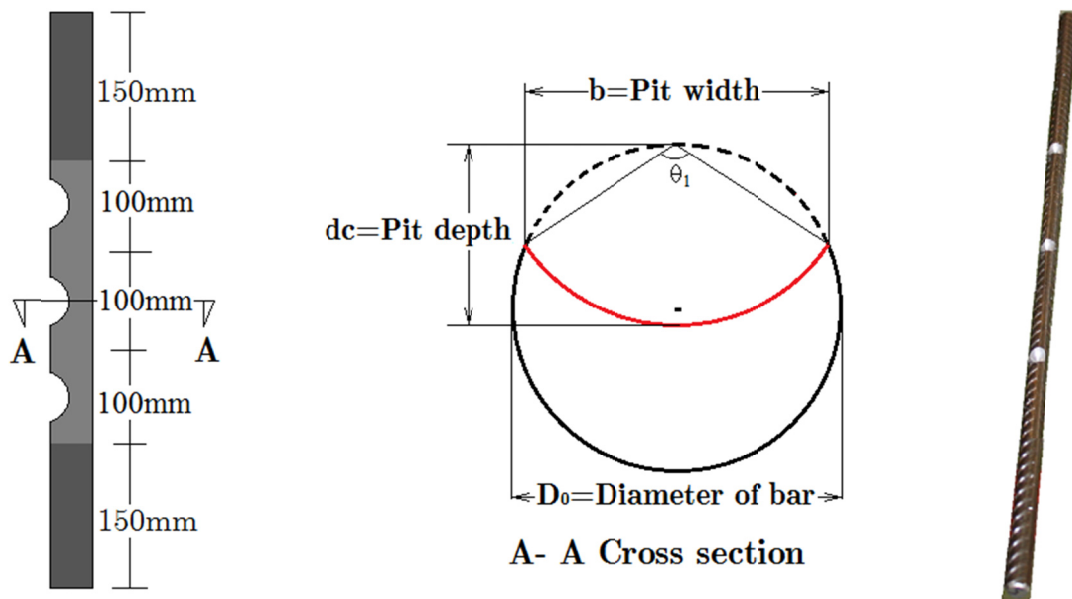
Left: geometry of pitting corrosion Middle: cross-section details of samples; Right: steel bar prepared for tensile tests
